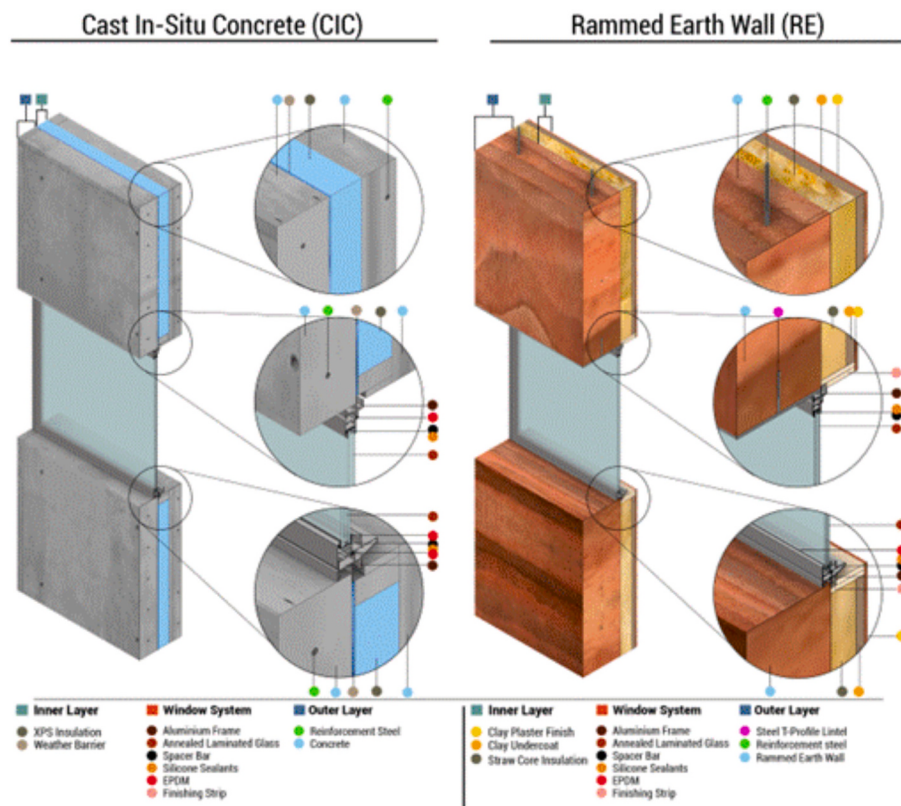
Assembly Details of Cast-in-situ concrete (CIC) and Rammed Earth (RE) Façade Systems.
